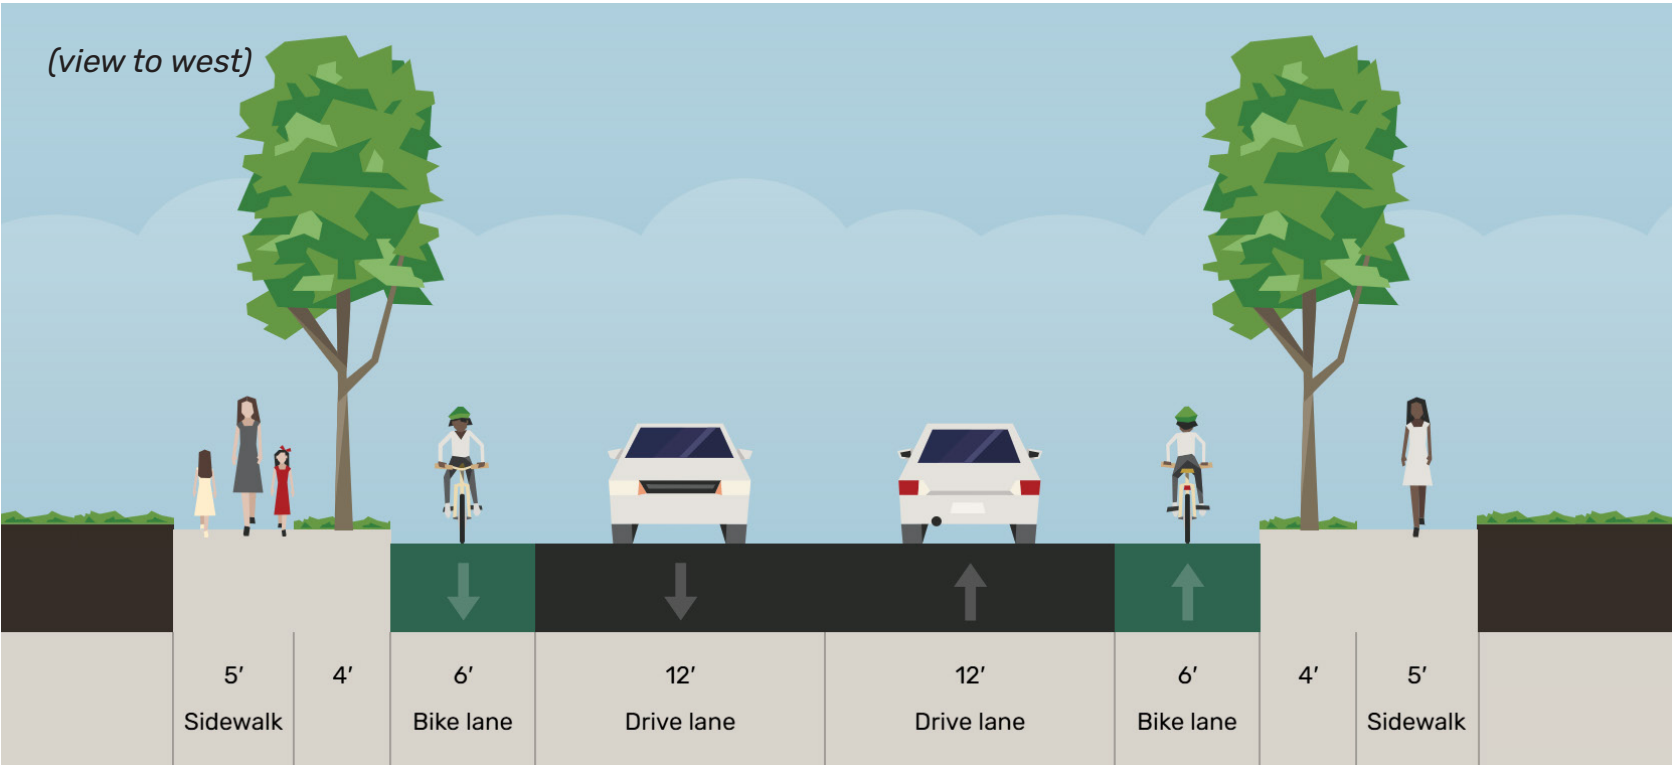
Proposed Typical Cross-Section on Church Drive (50'-55' ROW)
